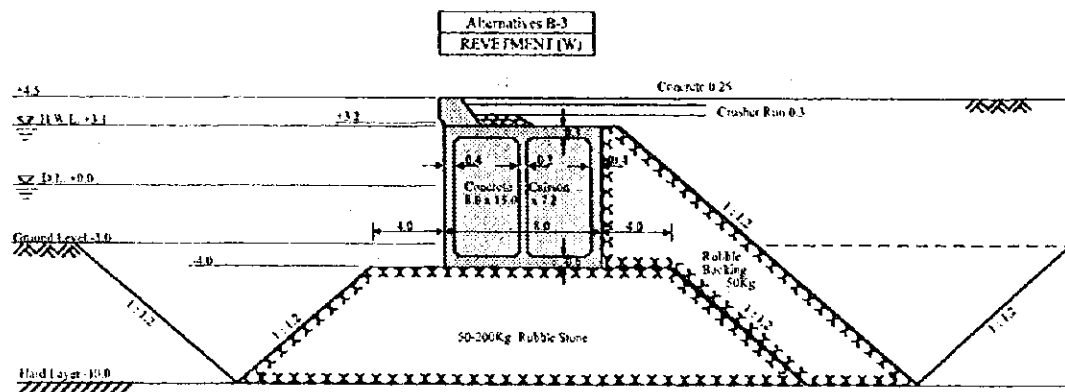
Concrete Caisson Type Revetment (-3m)
